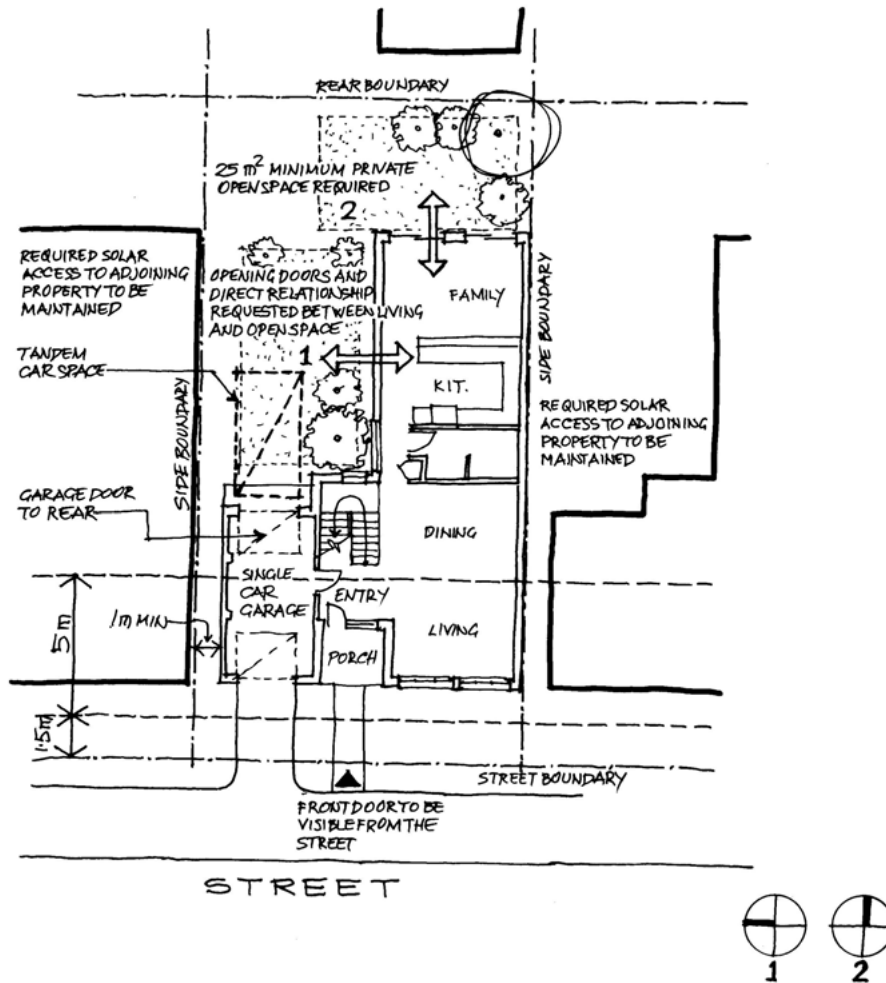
Two storey courtyard dwelling layout.
